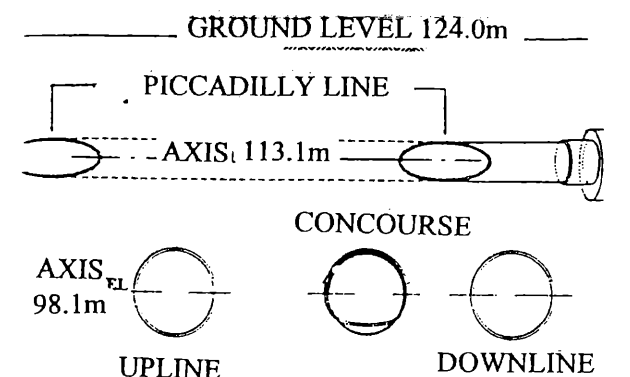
CTA STATION HEATHROW, SECTION OF NEW AND EXISTING TUNNELS.
